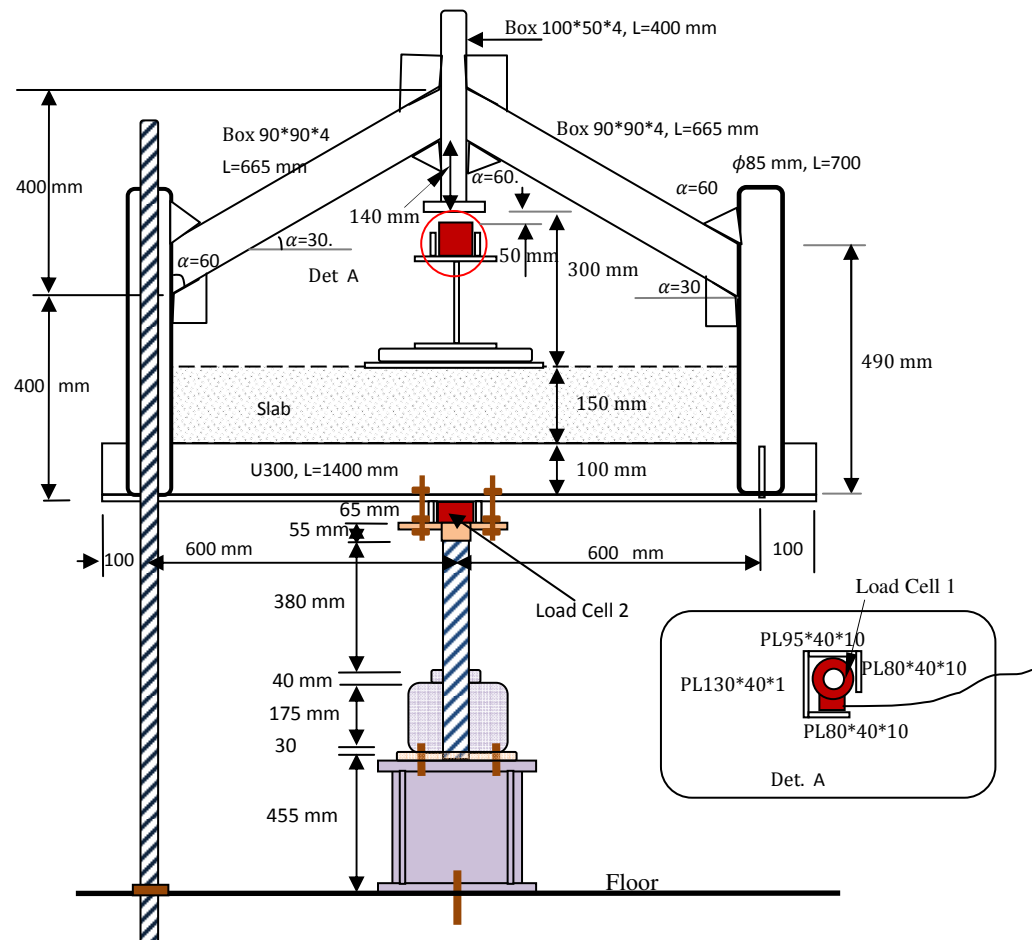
B. 3 Elevation of loading details at floor-to-floor joint
